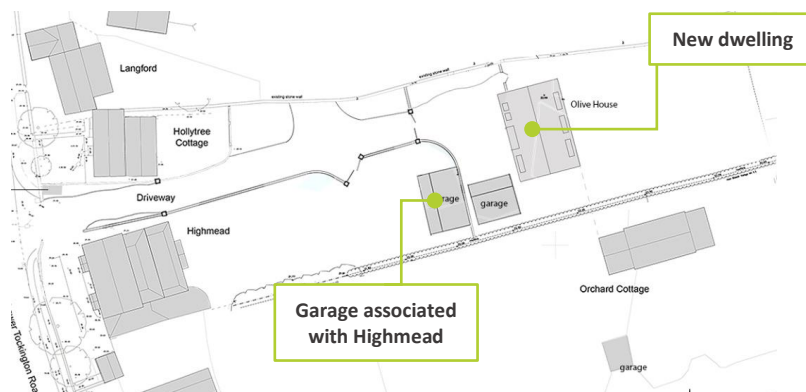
Proposed layout of new garages and dwellings (extract from Block Plan – drg ref: GI-311-22a)
